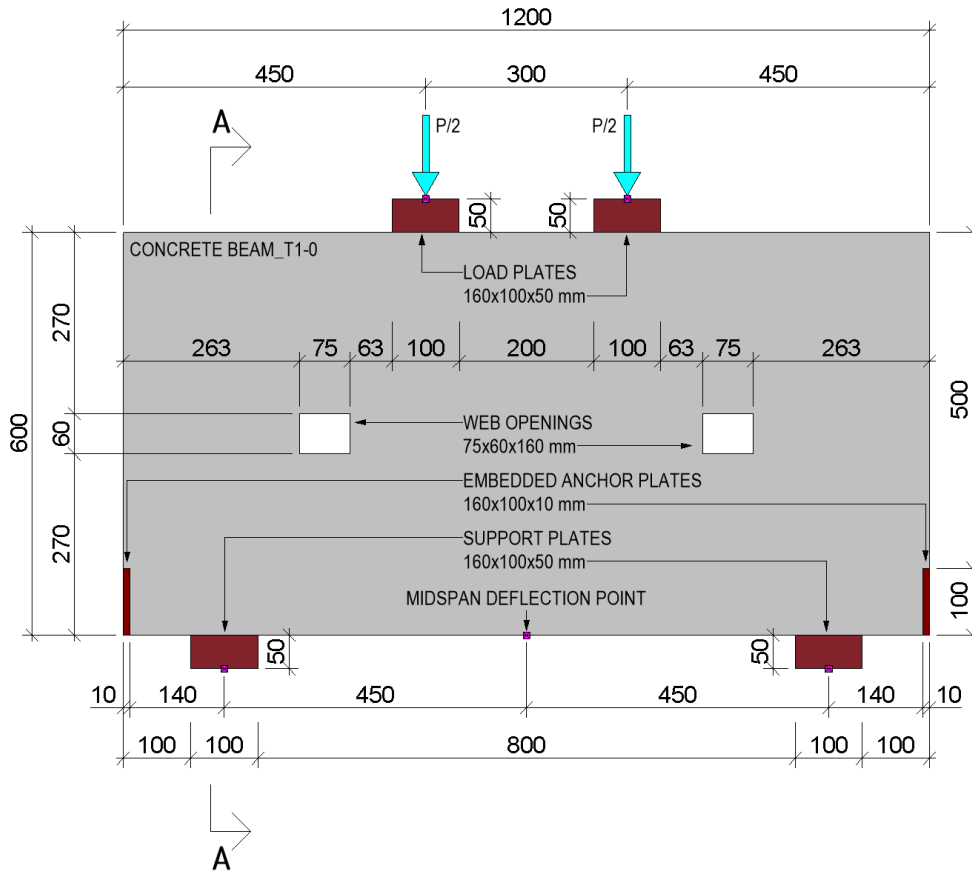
T1-0. Geometrical dimensions given in mm. Modelling tool [Autodesk Inc., 2018].
